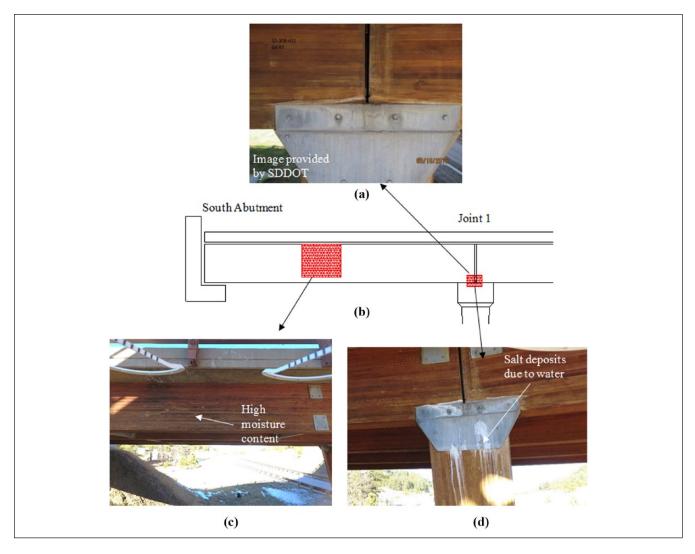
Sample damage on girder: (a) image provided by South Dakota DOT (13), (b) damage location, (c) some moisture on the side of Girder 4 between South Abutment and Joint 1, and (d) salt deposits caused by water coming from the deck at the support of Girder 4 at Joint 1.
